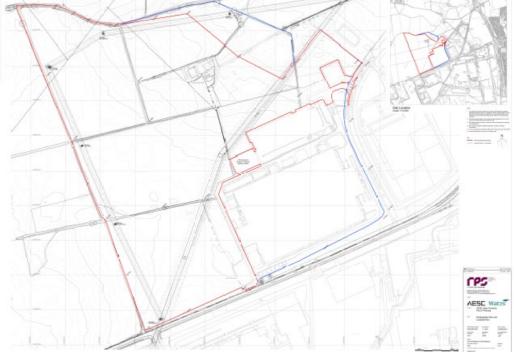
AESC Plant Three red line boundary (extract of Site Location Plan produced by RPS)
